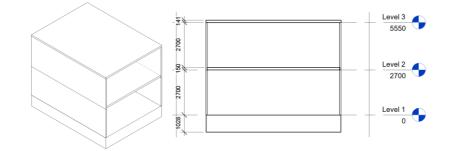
REVIT BIM MODEL – A TWO-STORY BUILDING WITH ONE WALL ELEMENT FOR EACH STORY – LEFT: 3D VIEW. RIGHT: ELEVATION VIEW
